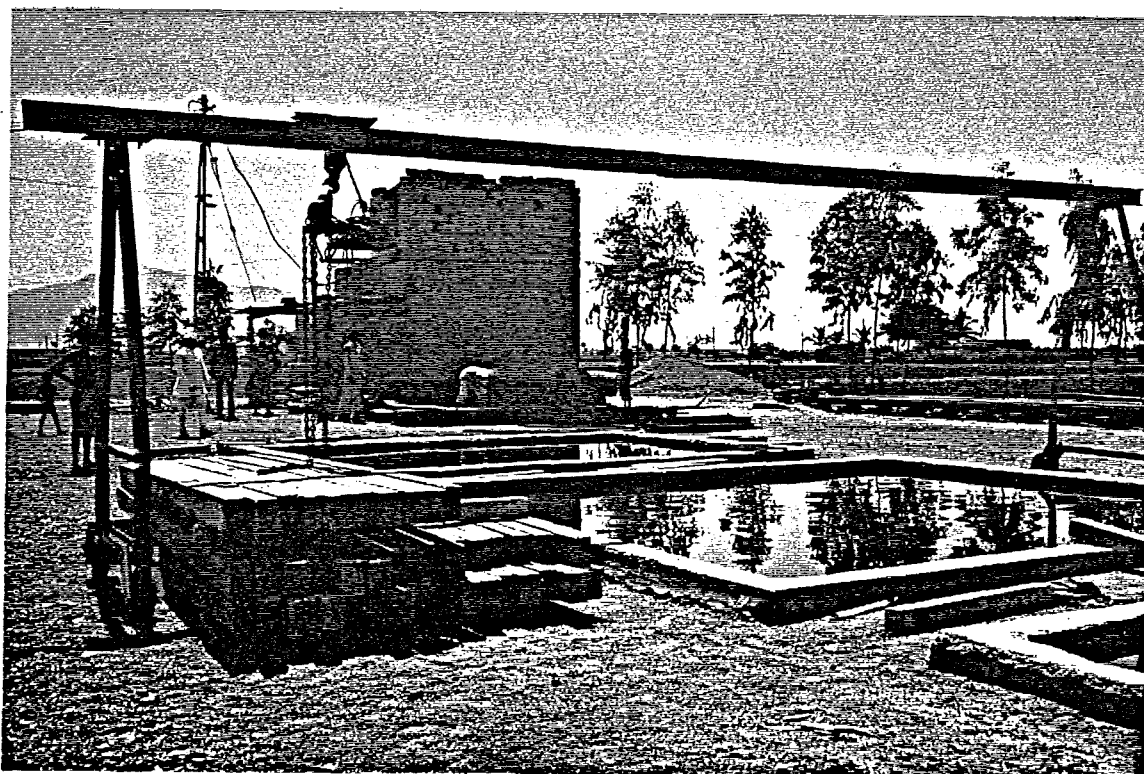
Precast concrete roof beams plant. Owned by city based entrepreneurs. State support for cement and steel and the neglect of the rural timber industry results in concrete replacing timber roofs (near Chitradav).
